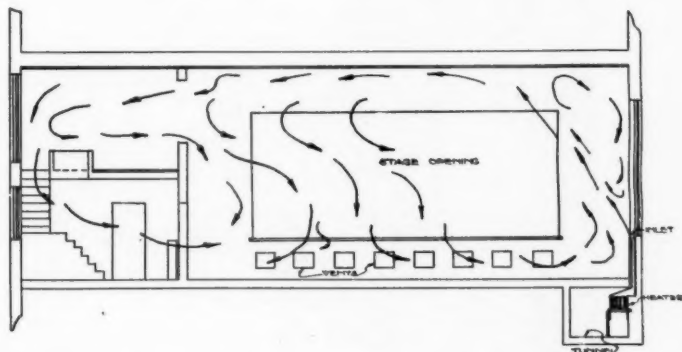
CROSS SECTION AT CENTER OF ROOM LOOKING EAST
